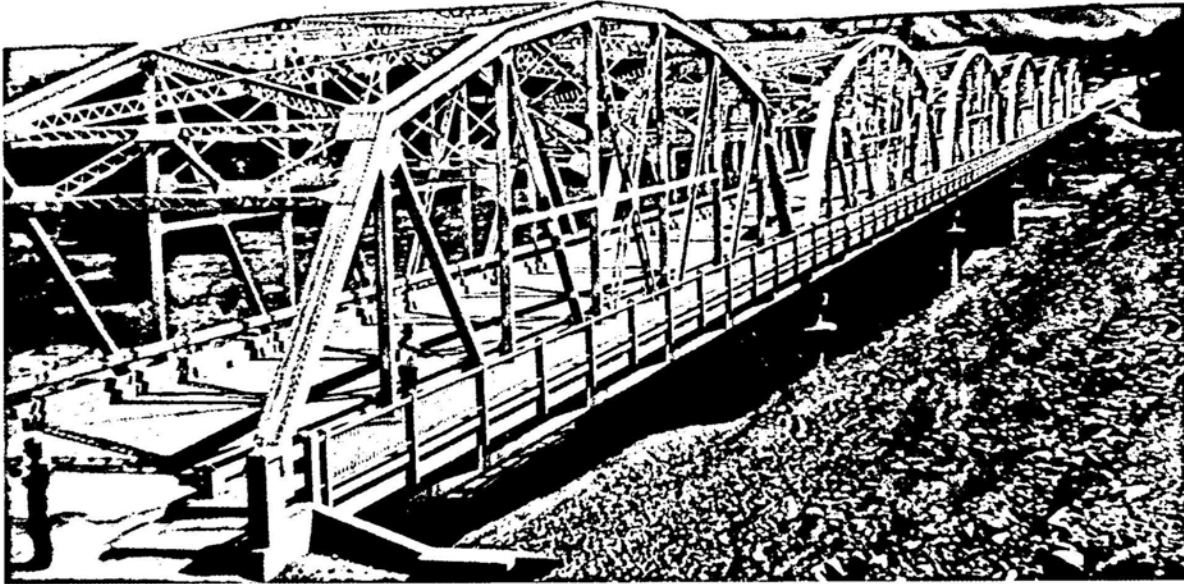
San Juan River Bridge at Shiprock (No. 1792). The San Juan River Bridge at Shiprock was completed in 1937 and represents the high point of steel through truss construction in New Mexico. (Highway Department Bridge Files)
